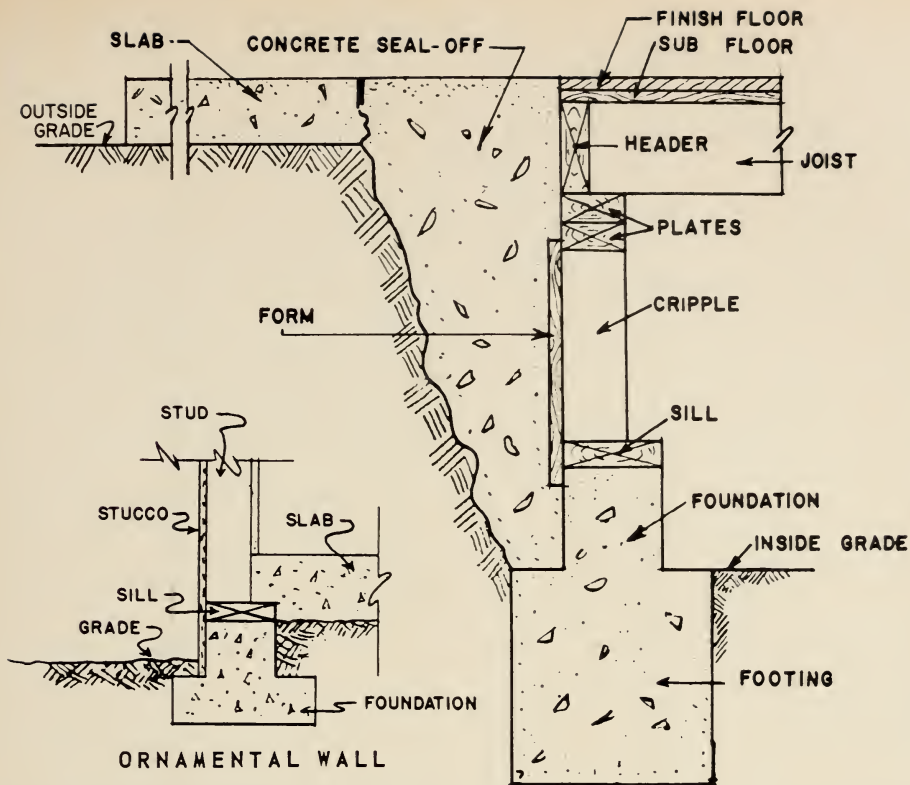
Concrete "seal-off" used to seal foundation away from earth-filled porch. Lower left: ornamental wall sometimes built around a slab porch; this may also require a sealoff. (From Heal, 1951.)
